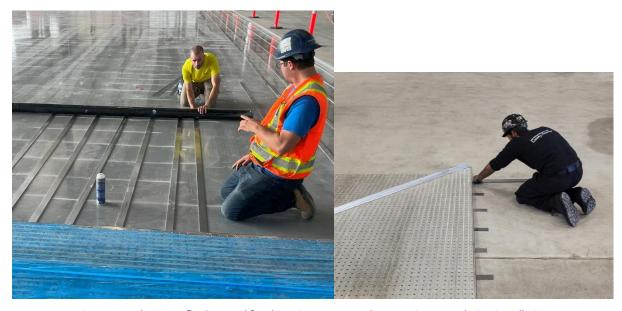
Aluminum flat bar used for shimming to proper slope requirements during installation
